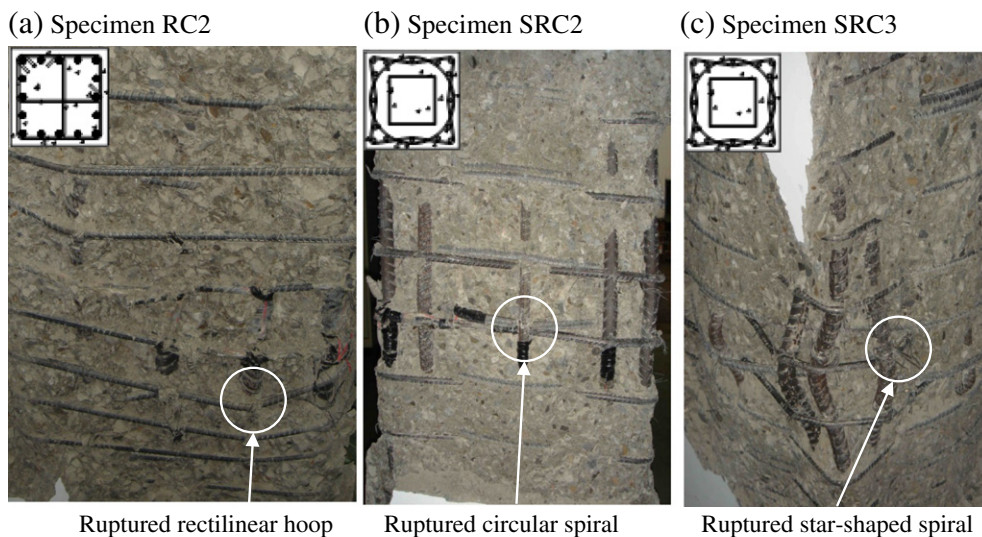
Failure appearance of specimens after removing the spalled concrete cover.
